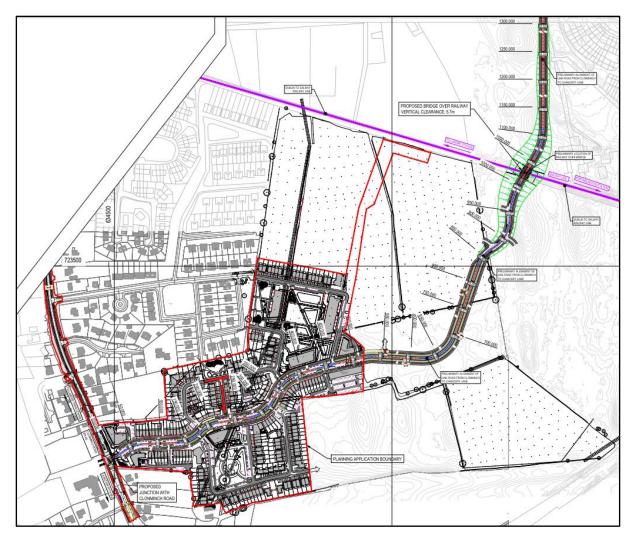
Extract from DBFL Drawing 1005- Preliminary alignment of road and railway bridge crossing
